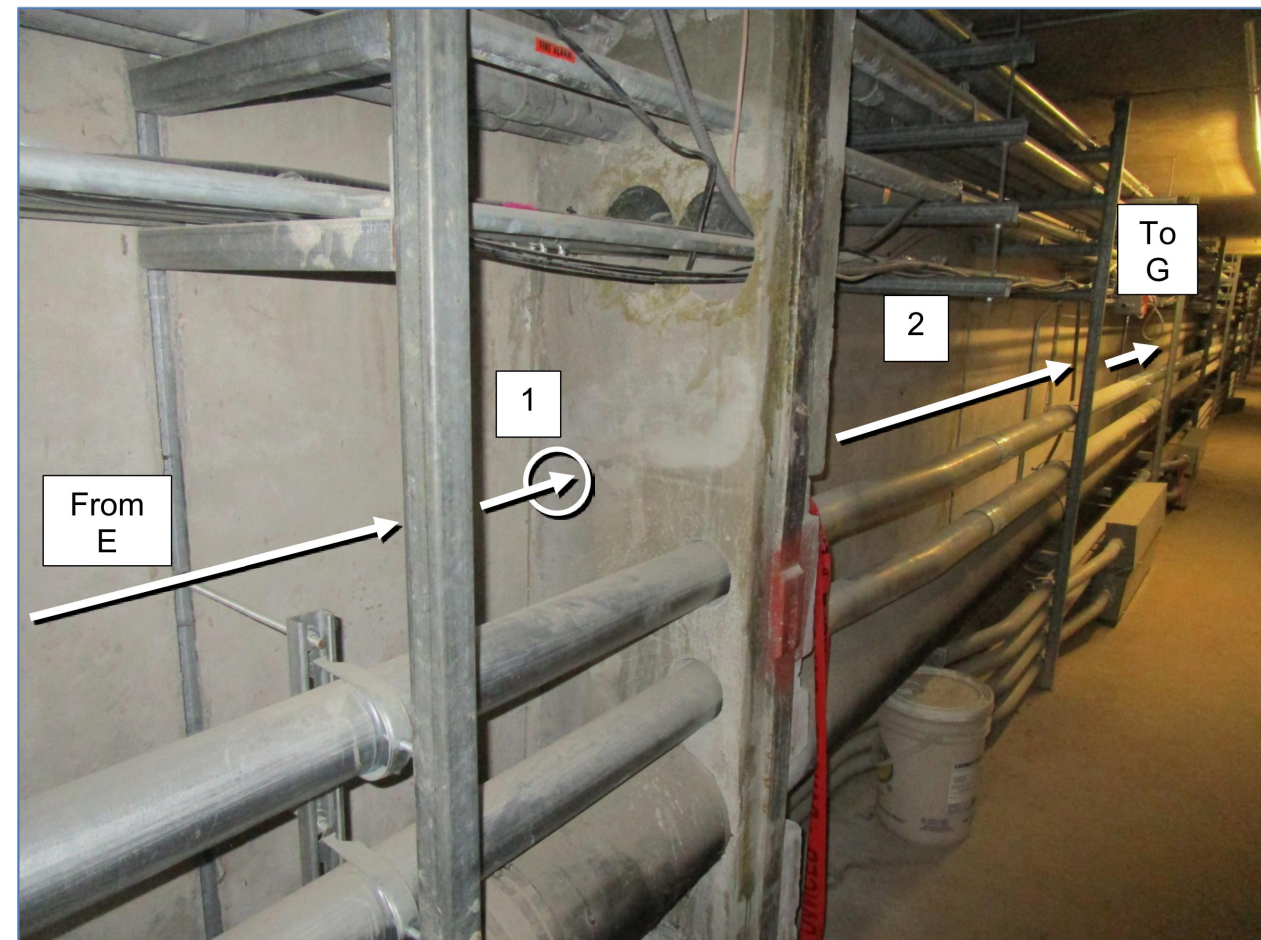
Location F, pass through concrete wall next to tunnel gate
